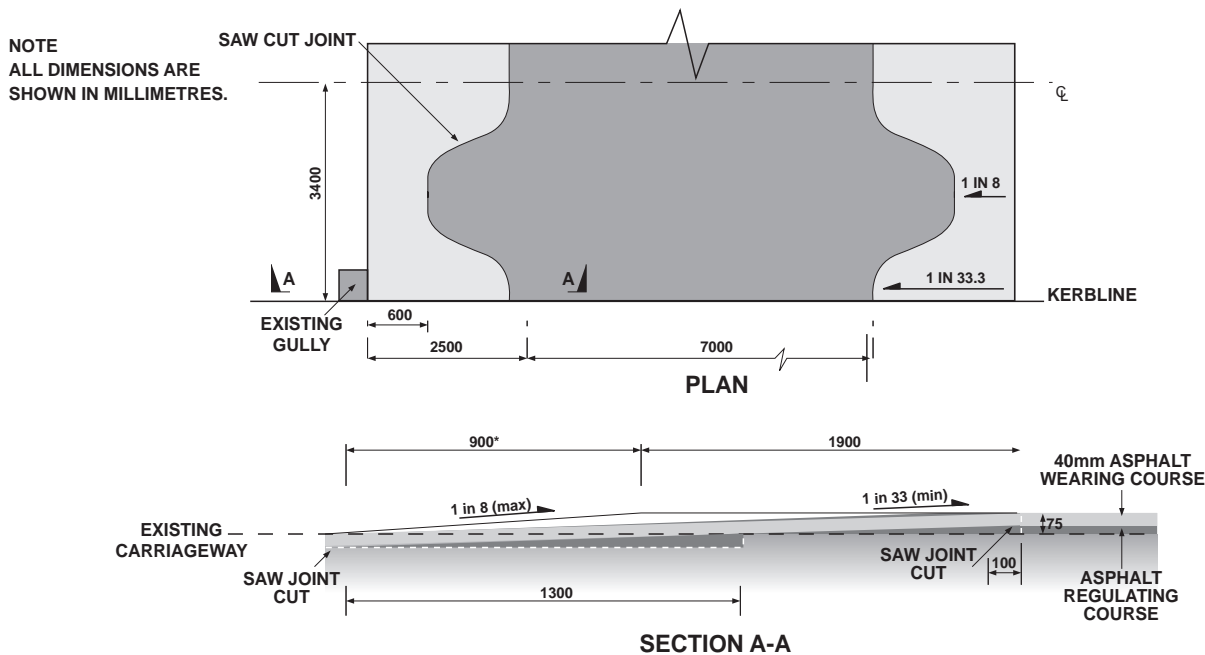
Plan view and cross-section of an 'S' road hump
